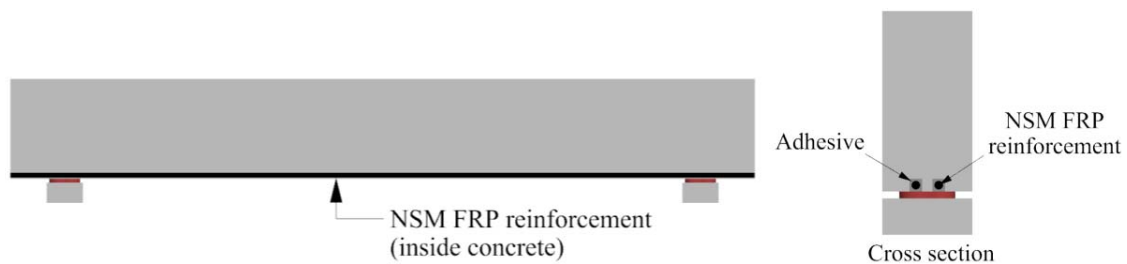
Typical NSM FRP strengthening system for concrete beams
